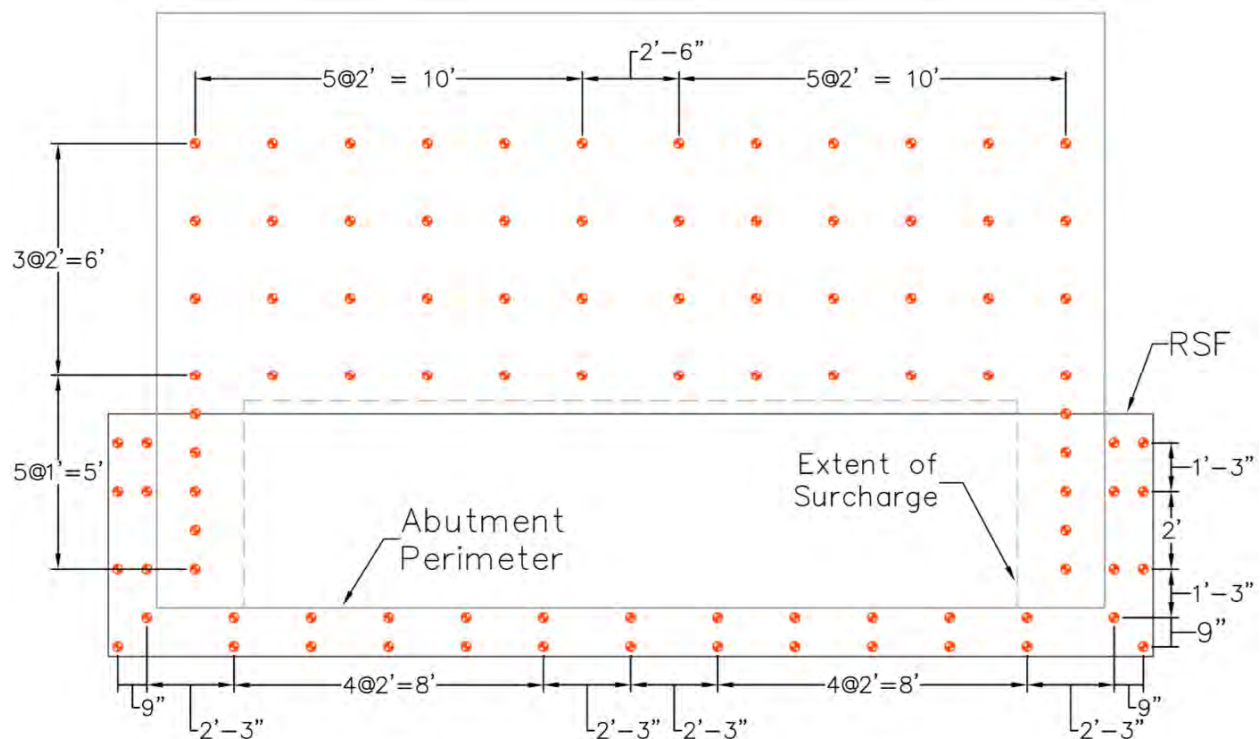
Plan View of Survey Points on Top Surface of Abutment and RSF
